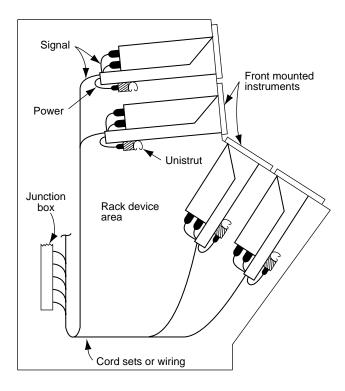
Panelboard Wiring Terminating Field Wiring at Panel-Mounted Junction Box
